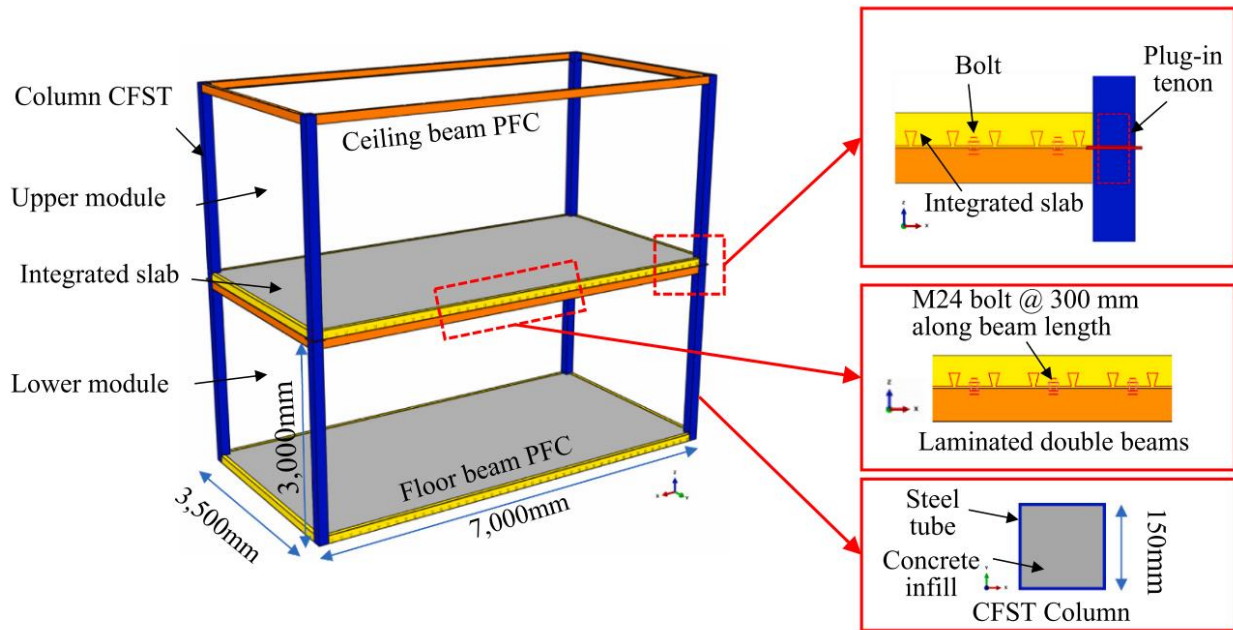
Corner-supported steel-concrete composite modules (Peng et al., 2021)
